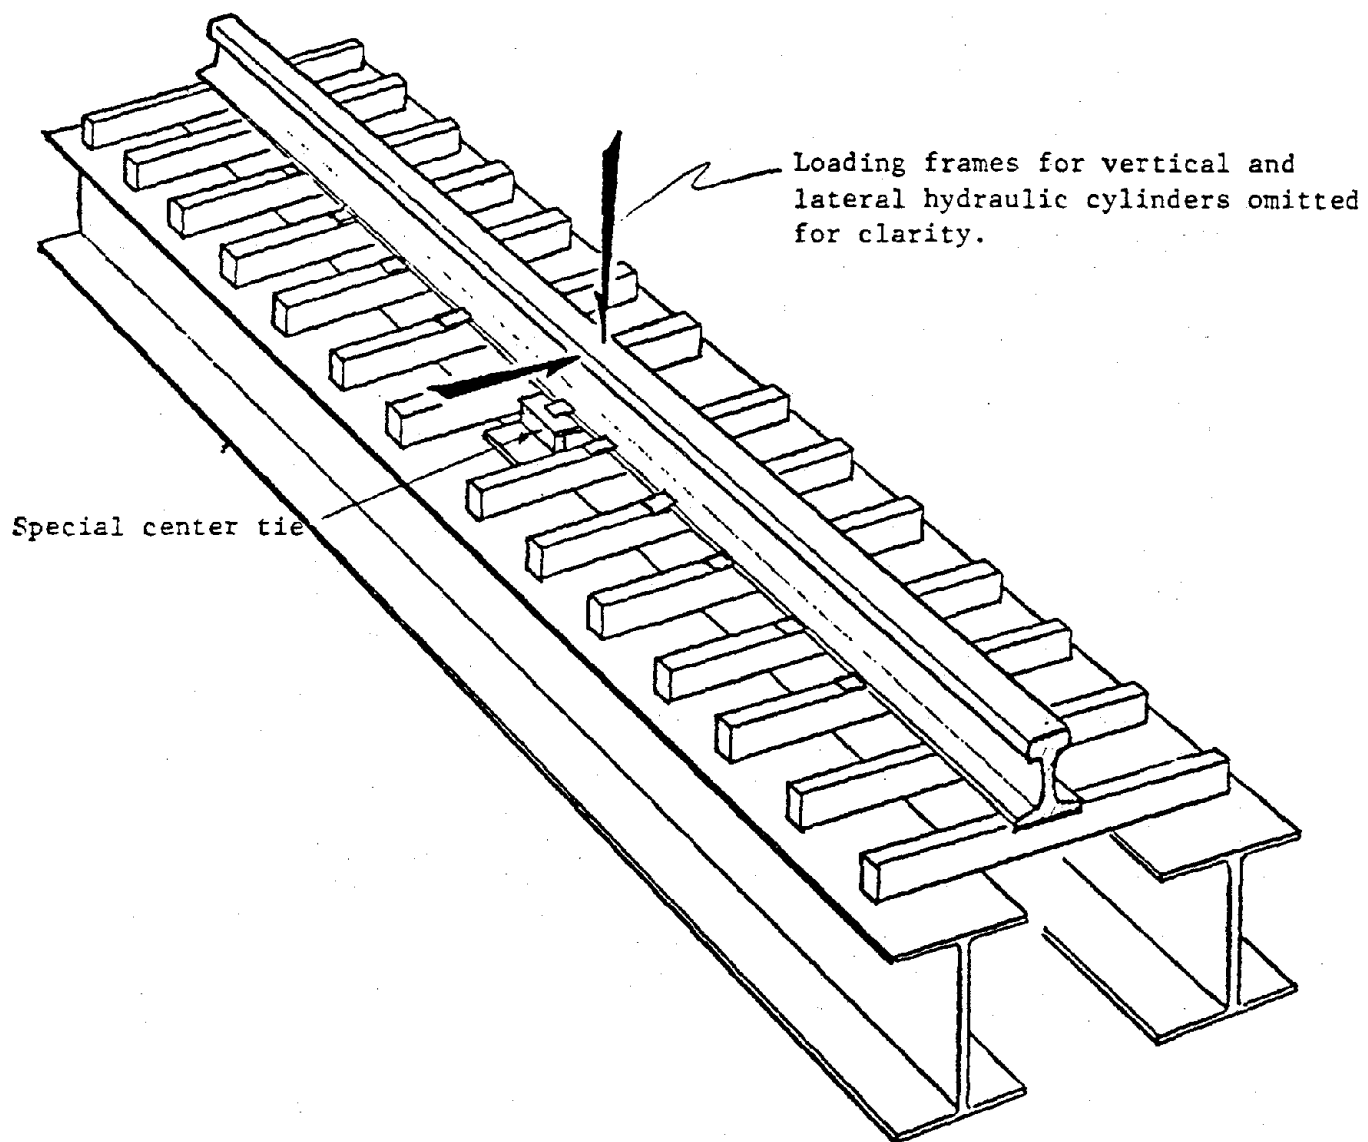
LABORATORY RAIL TEST FIXTURE
